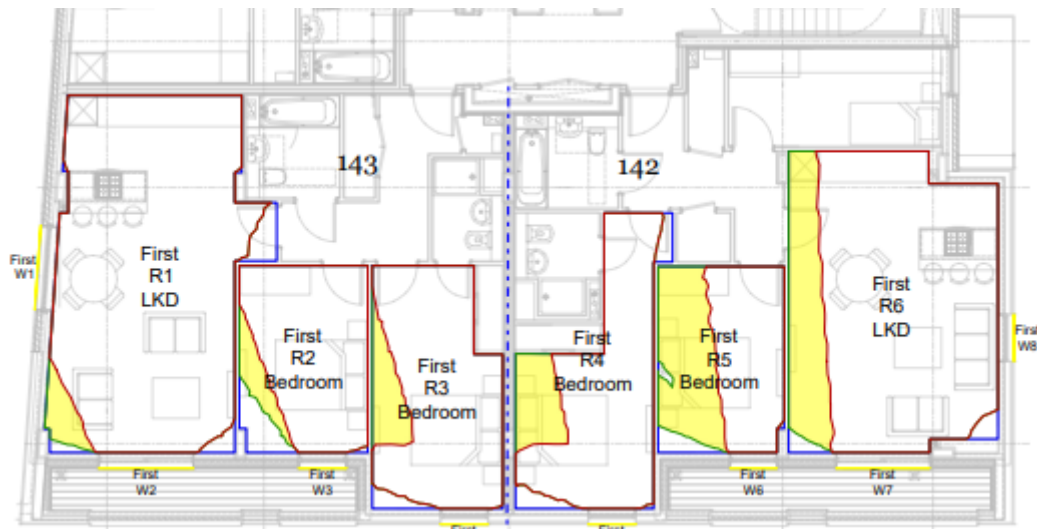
Chi Building typical layout (from neighbouring development (PA/19/00559) submission)
